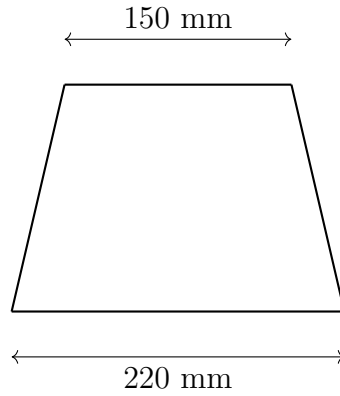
Simplified trapezoidal rail cross section used in the finite element model.
